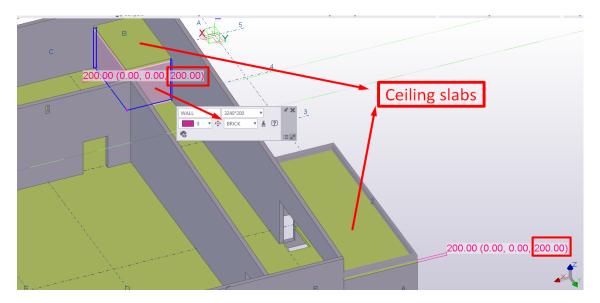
Brick walls and ceiling slabs of the Mall project.
